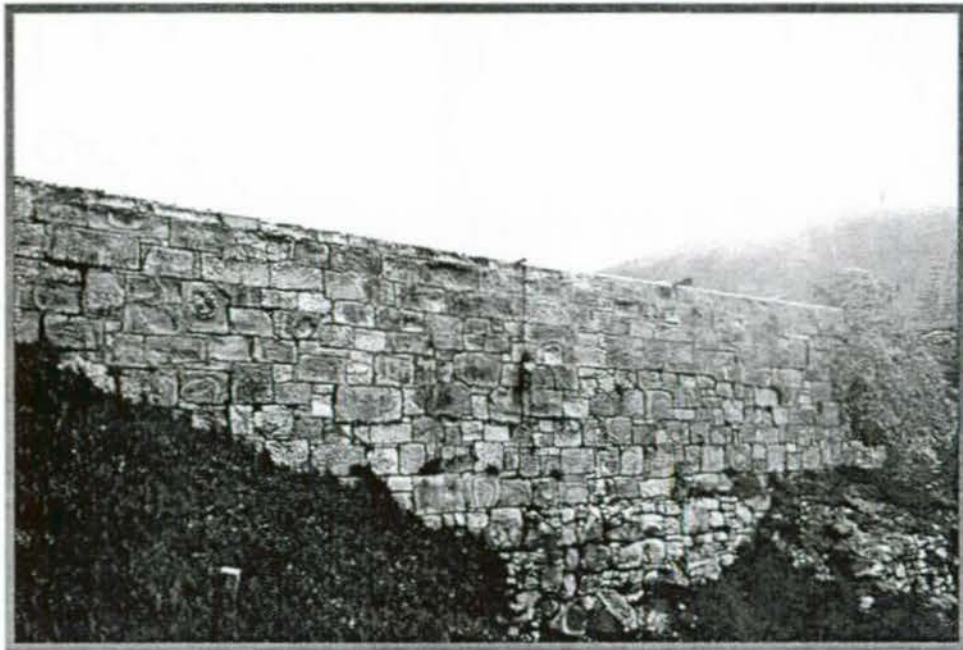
Full view of sandstone wall; deterioration of the mortar joints and stone faces is continuous along length of wall.
